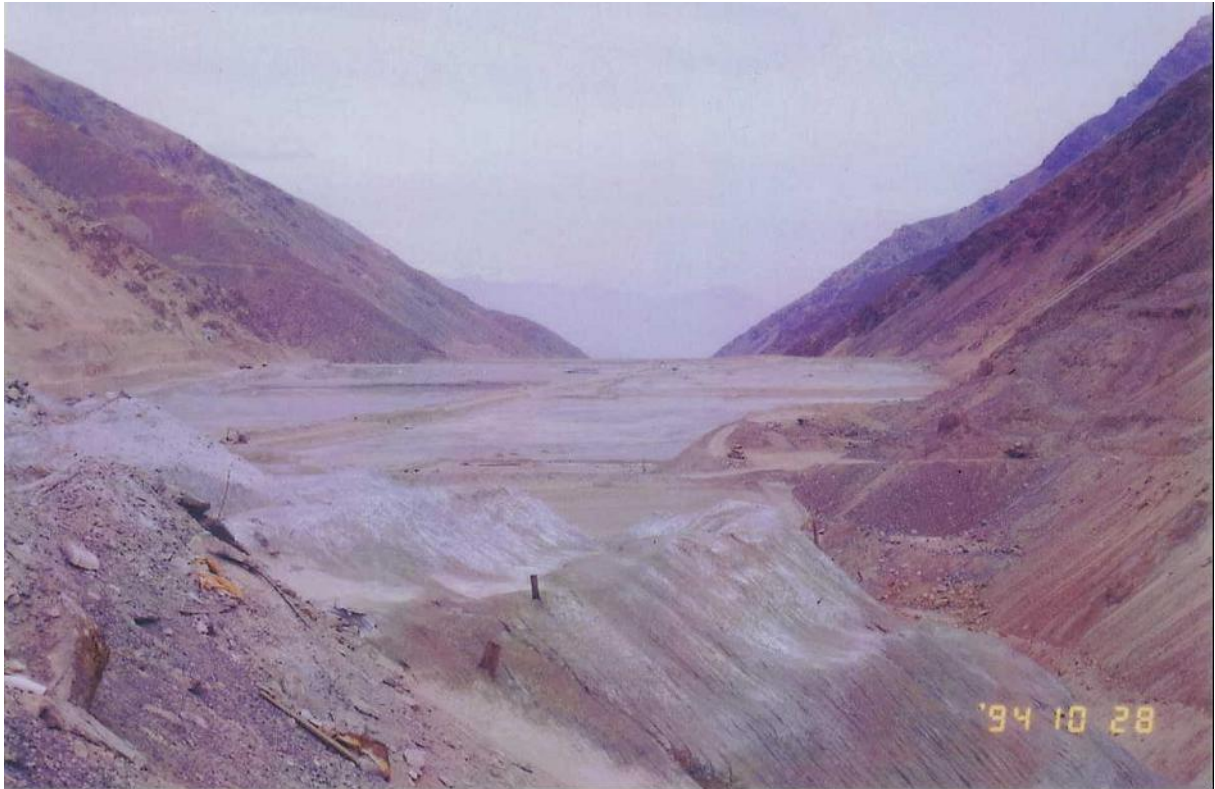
Copihues tailings dam prior to commencement of hydraulic mining
